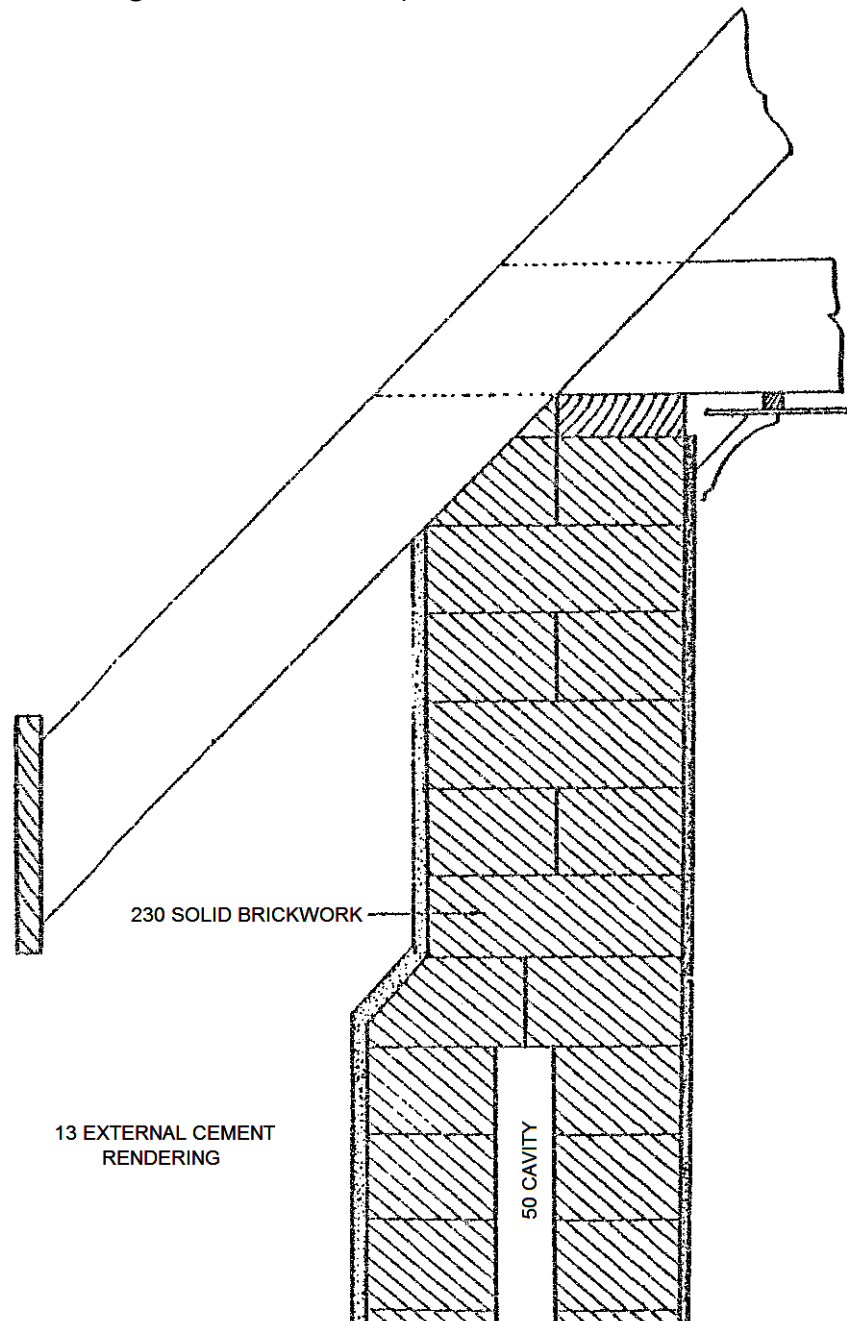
Section through 280 mm cavity wall at the eaves showing “sealing off” of cavity
